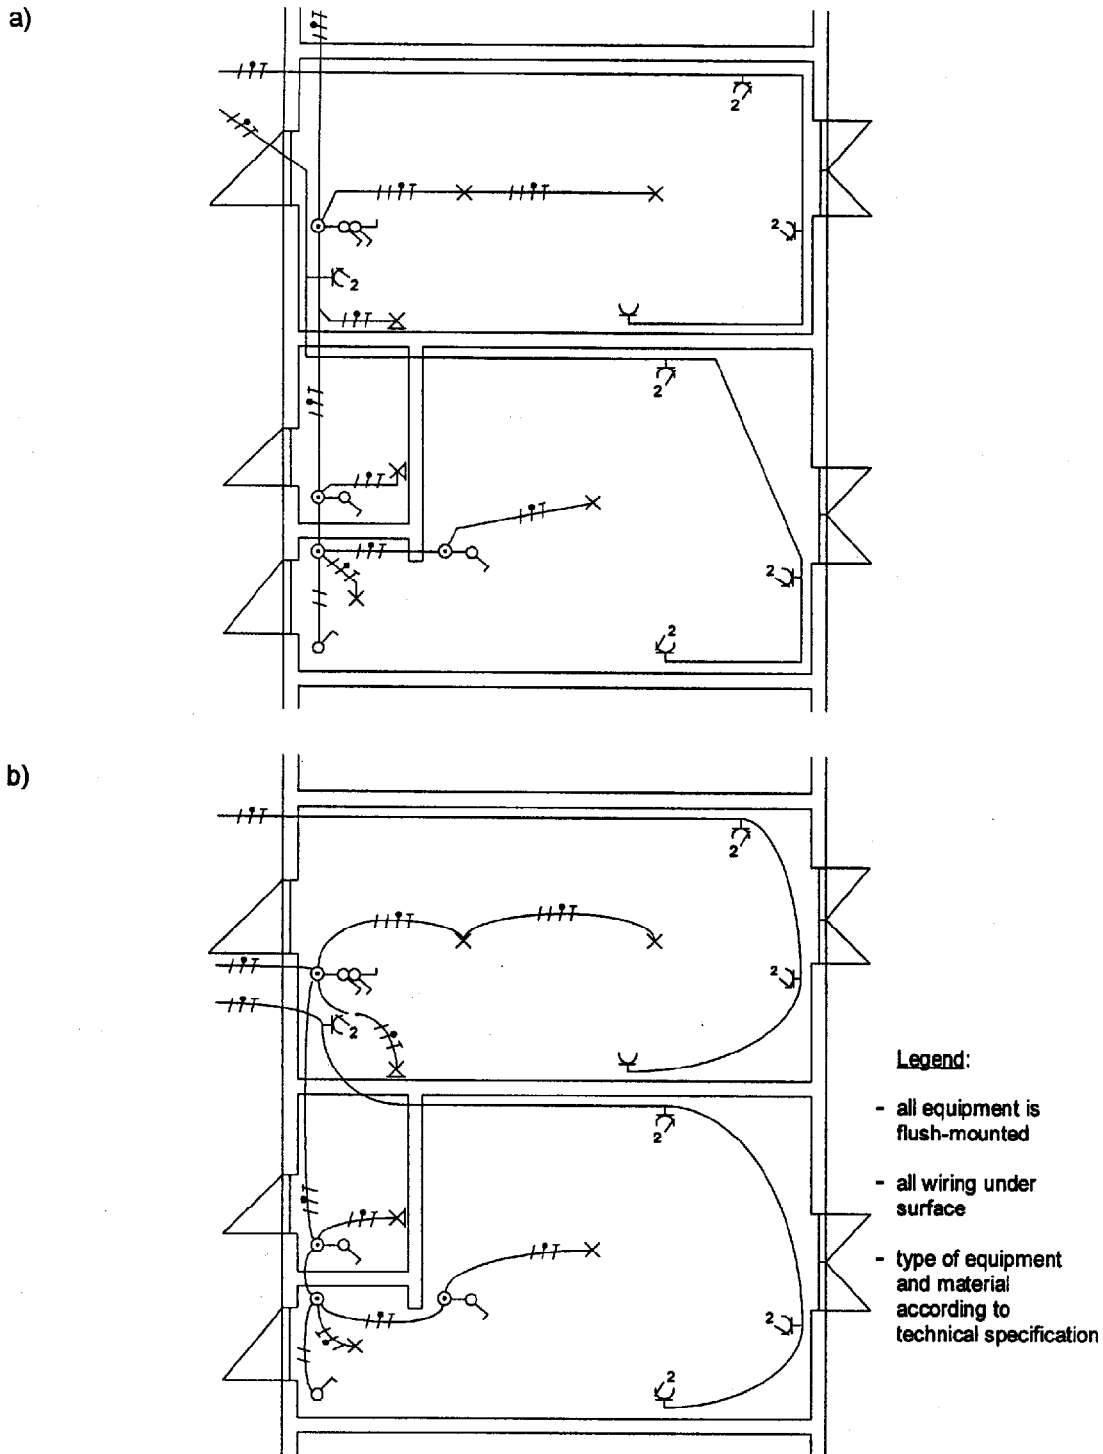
Examples of a installation diagram for a building (two different methods): electrical power installation in a residential building (see 5.3.2)
